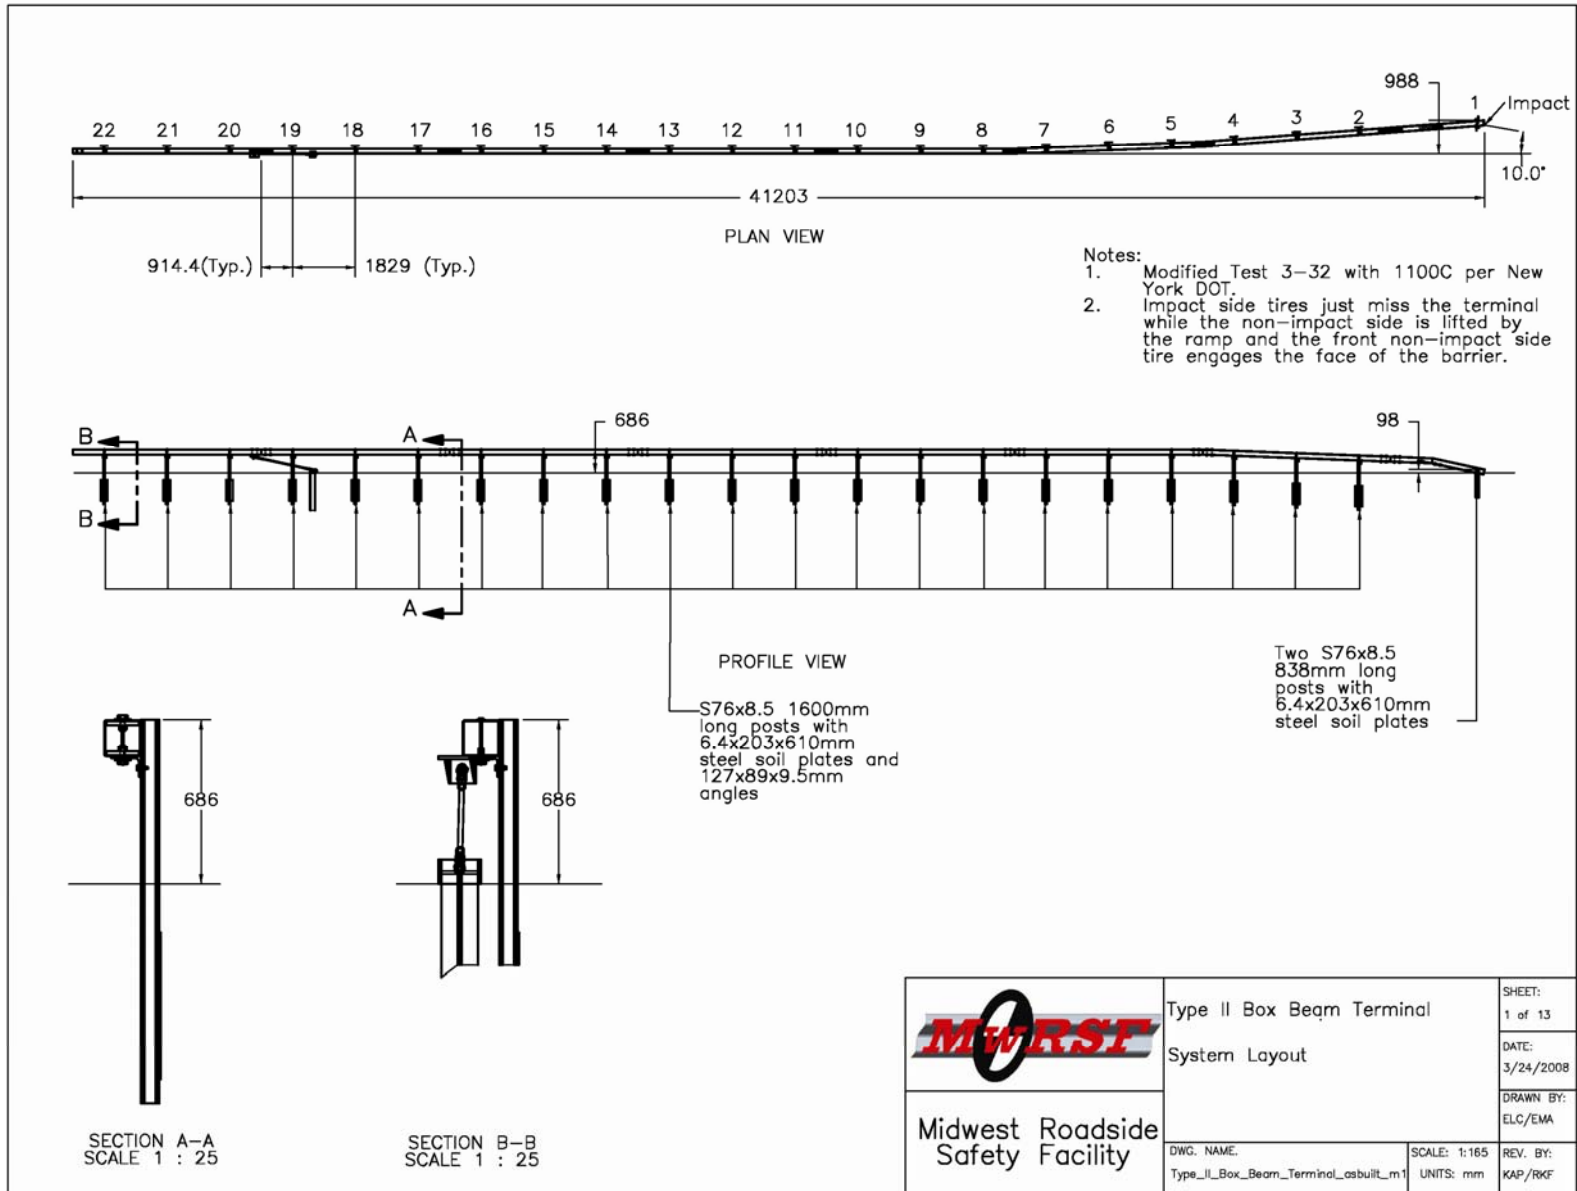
Type II Box Beam System Details, Test No. NYBBT-1
